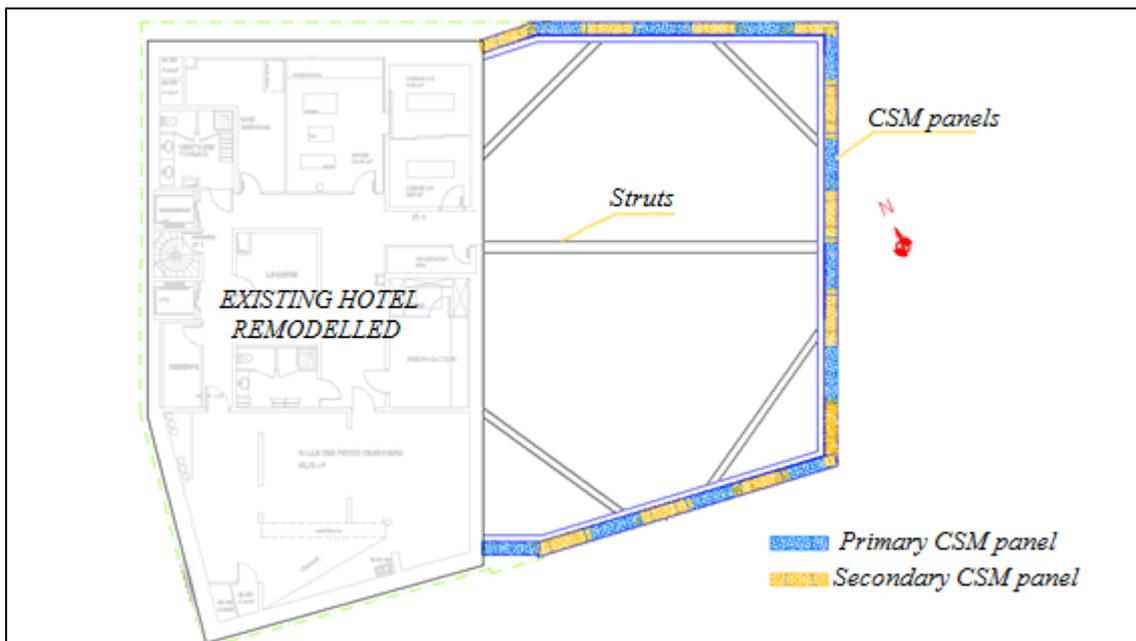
Plan of the CSM retaining wall and the horizontal steel pipe struts.
